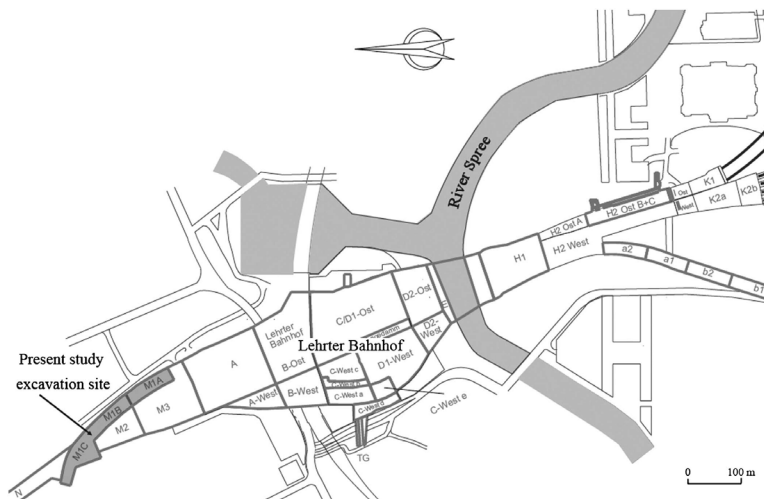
M1 pit deep excavation location (Nikolinakou M. A., Whittle, Savidis, & Schran, 2011)
